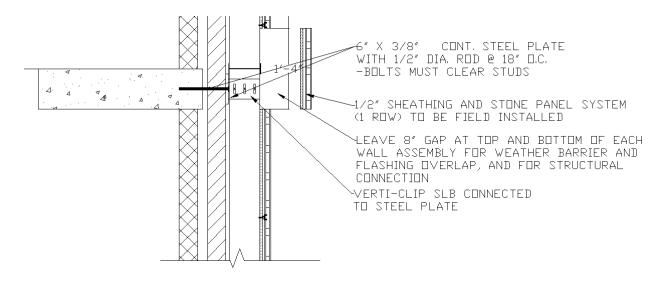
Prefabricated Wall Assembly Connection Detail | Quaid Spearing
